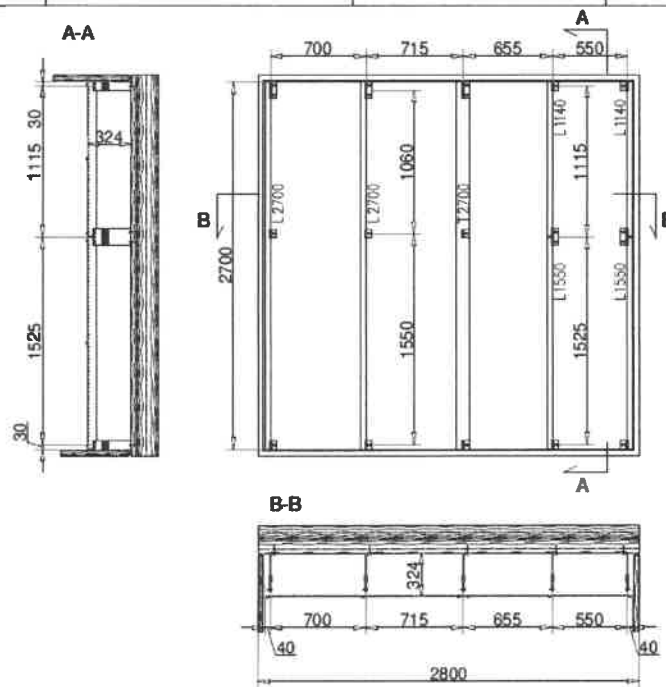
BSP KW4 kit with BSP KW4 PAS brackets – arrangement of test sample
